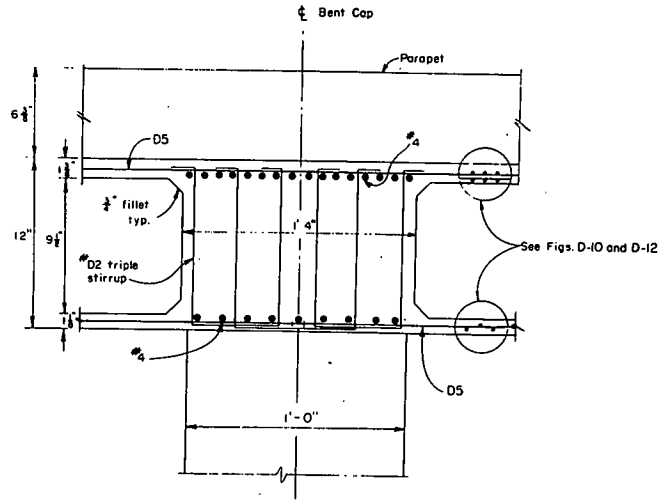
Section of Bent Cap in Single-Column Model Bridge
